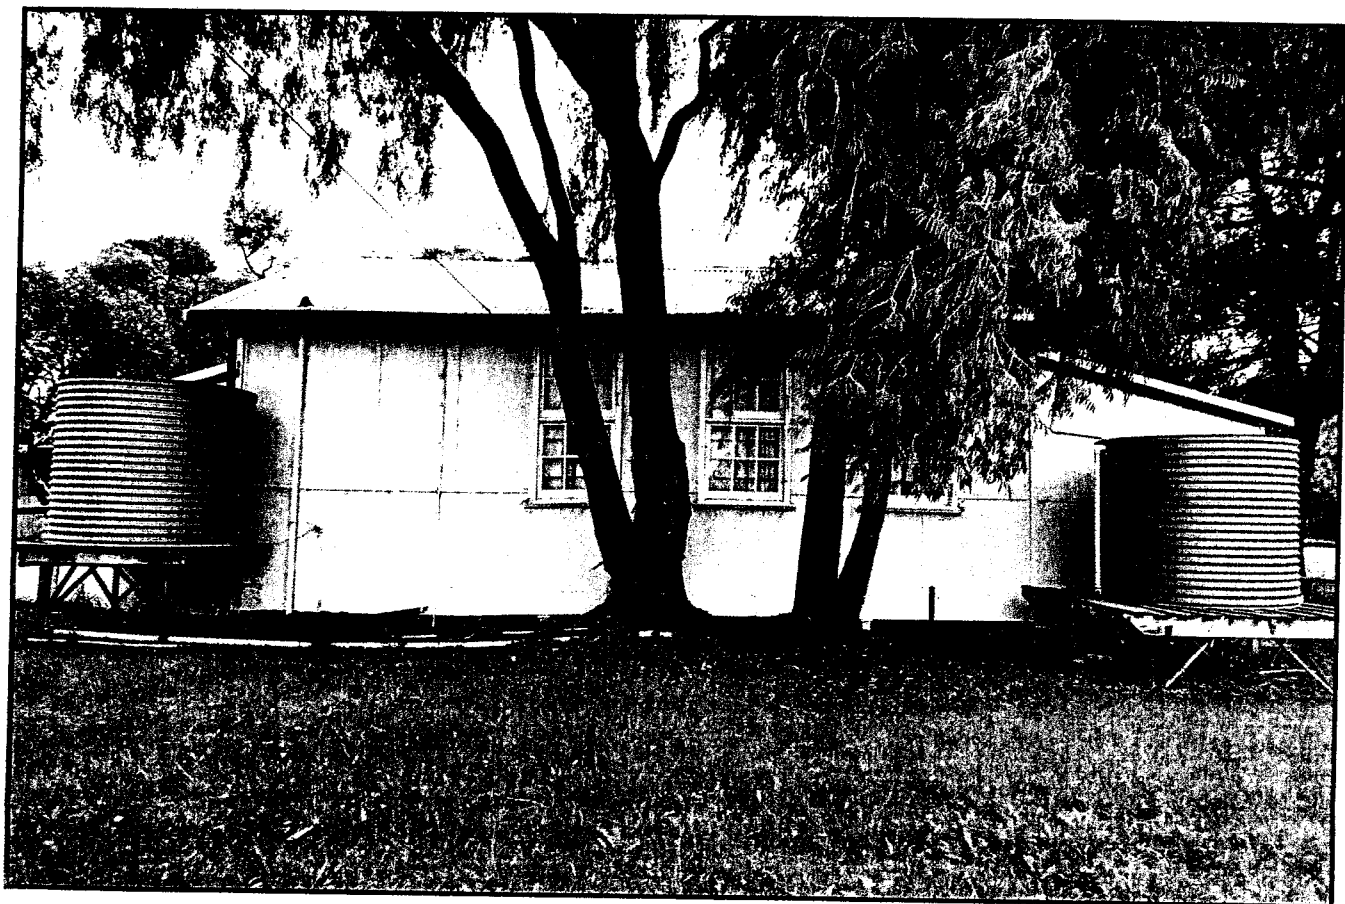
General view of side elevation of Play Group building; note proximity of trees to structure and slight uplift of window sills immediately adjacent trees
